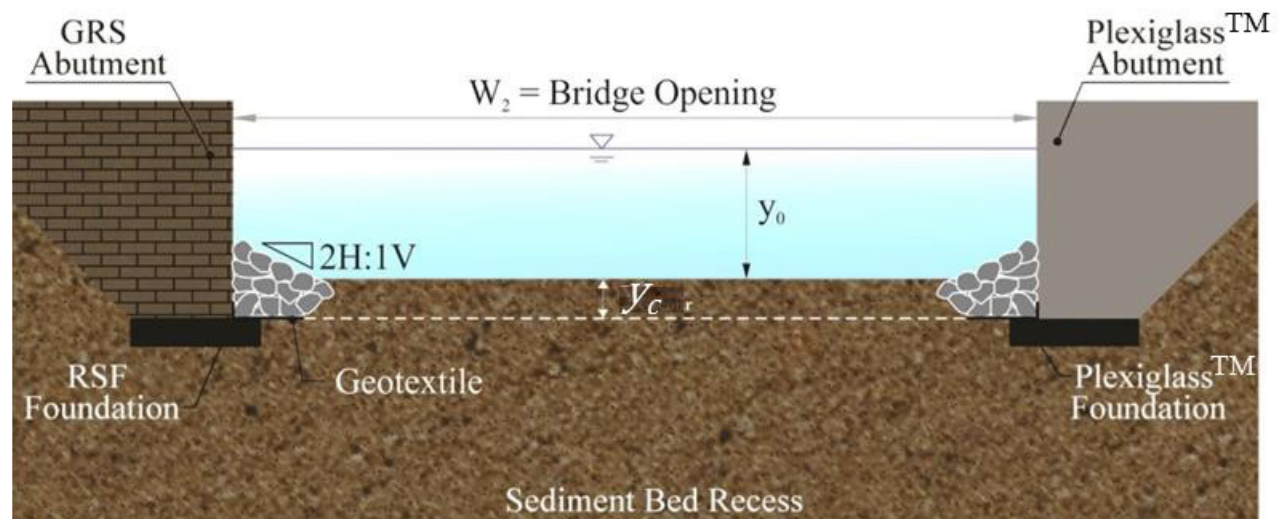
Sketch. Run 3 cross section—sloped field installation.
